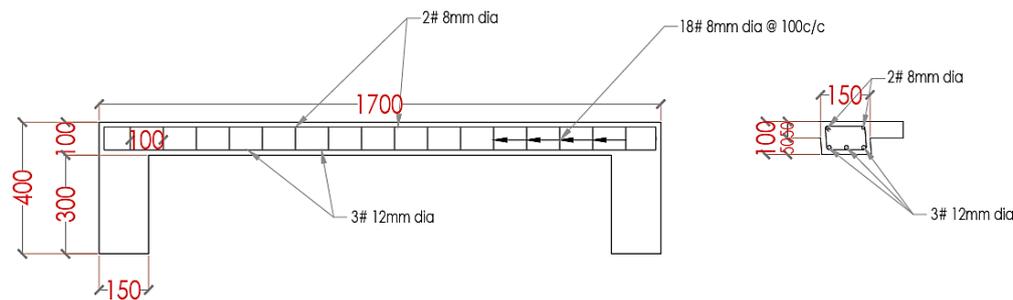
Longitudinal-section and cross-section of the beam with reinforcement details.
